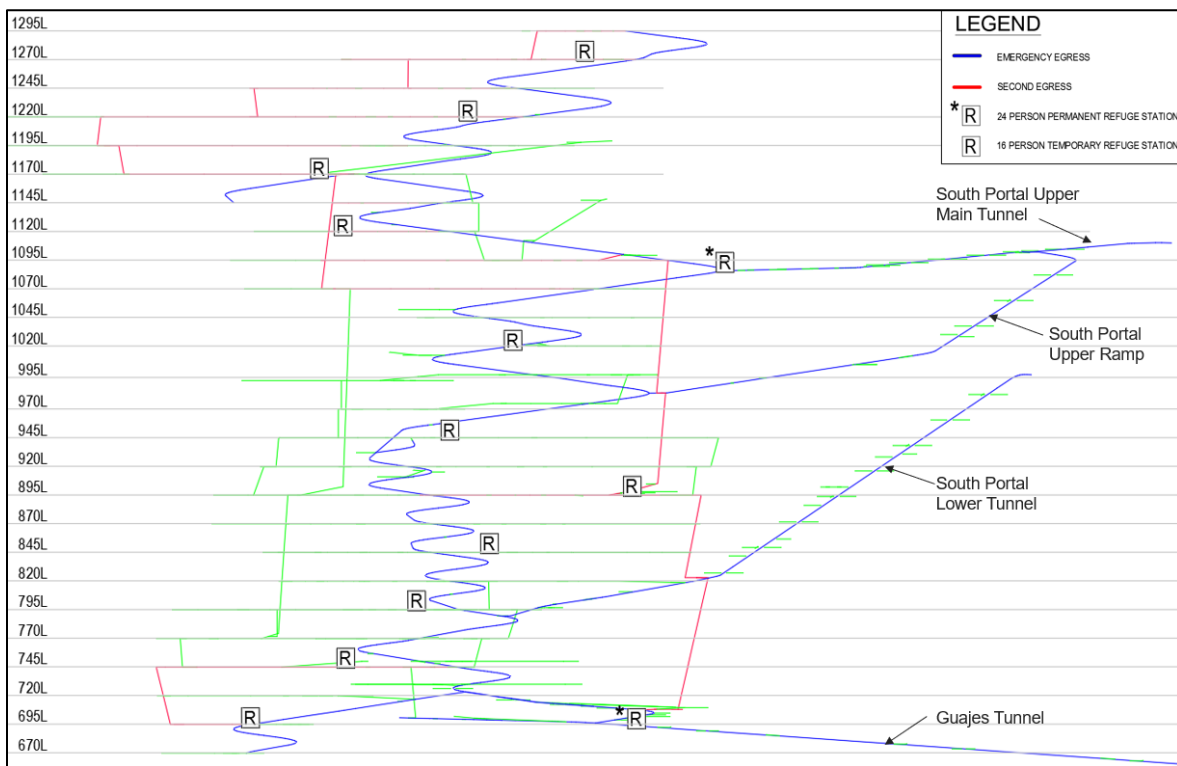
Emergency Egress Longitudinal View Looking Southwest
